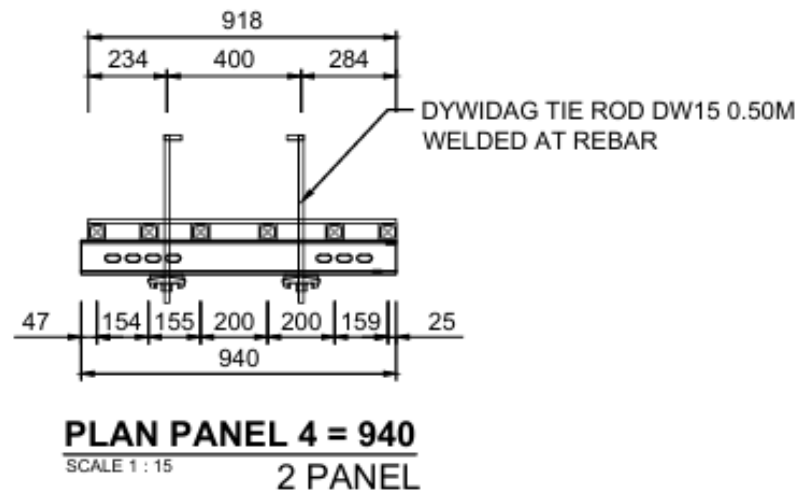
Top Detail of Formwork Panel 2 Dimension
